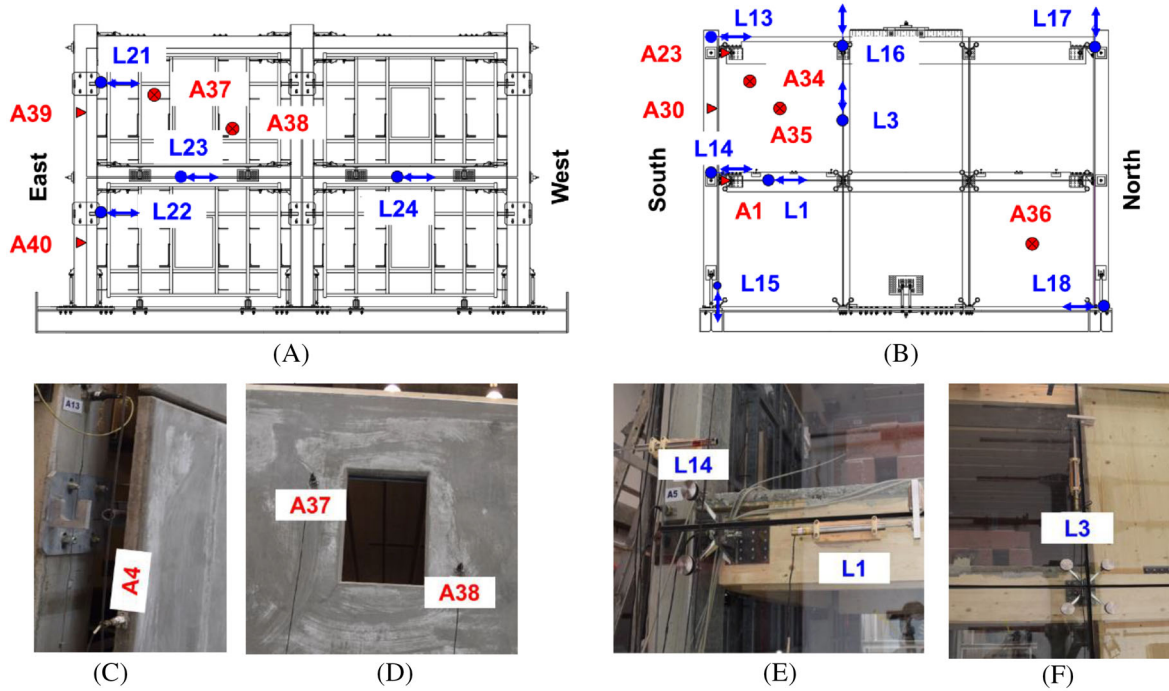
Instrumentation layout for: (A) the Glass Fiber Reinforced Concrete facade in the North side; (B) the Spider Glazing facade in the East side; (C–F) photos of some sensors.
